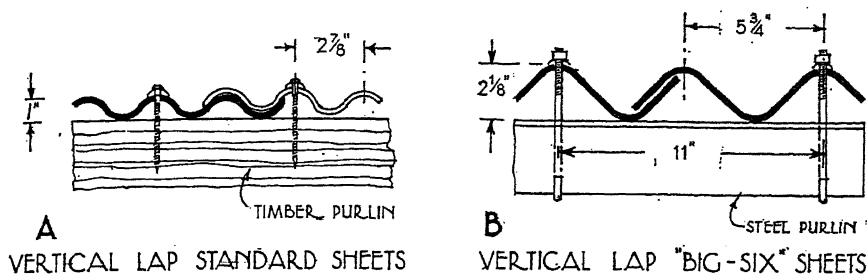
ASBESTOS-CEMENT CORRUGATED SHEETS
